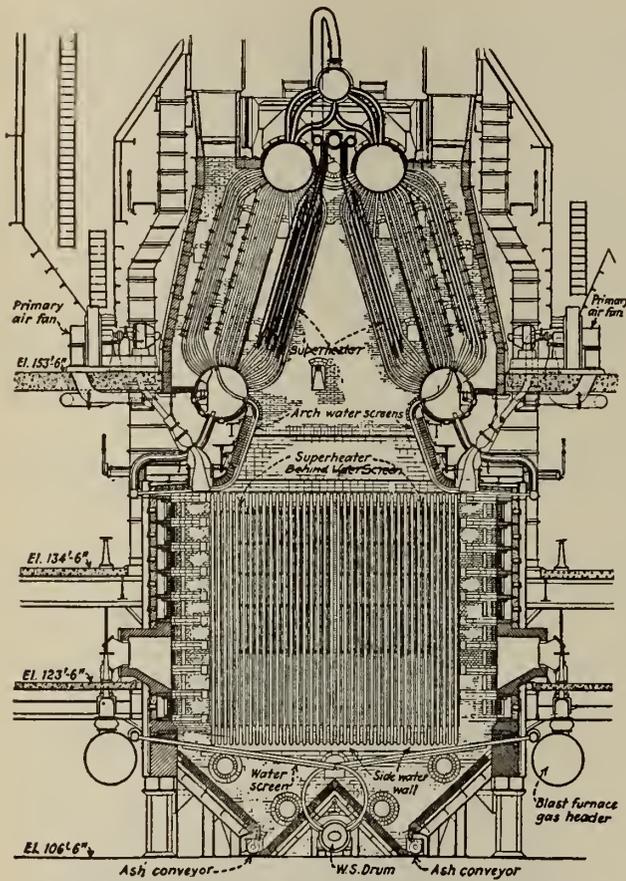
Section through Boiler and Revamped Furnace of Fordson Plant.
